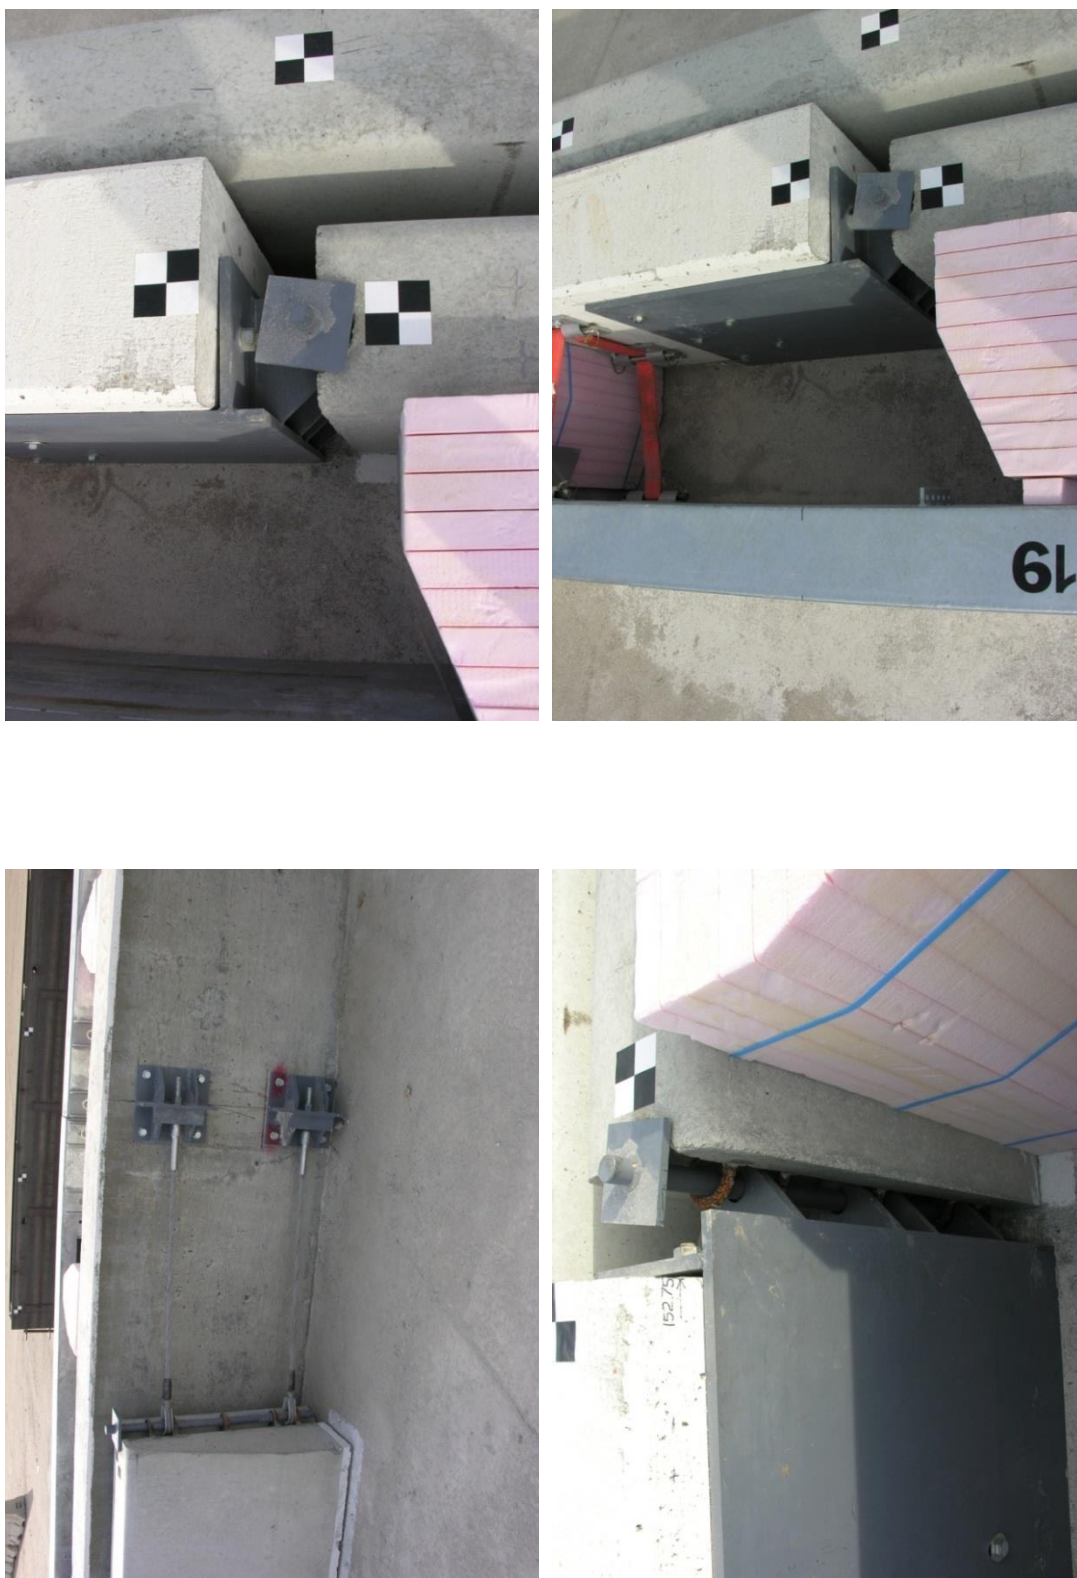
Pre-Test Photographs of SAFER on PCB Installed Across Opening, Test No. SPCB-1 [39-40]
